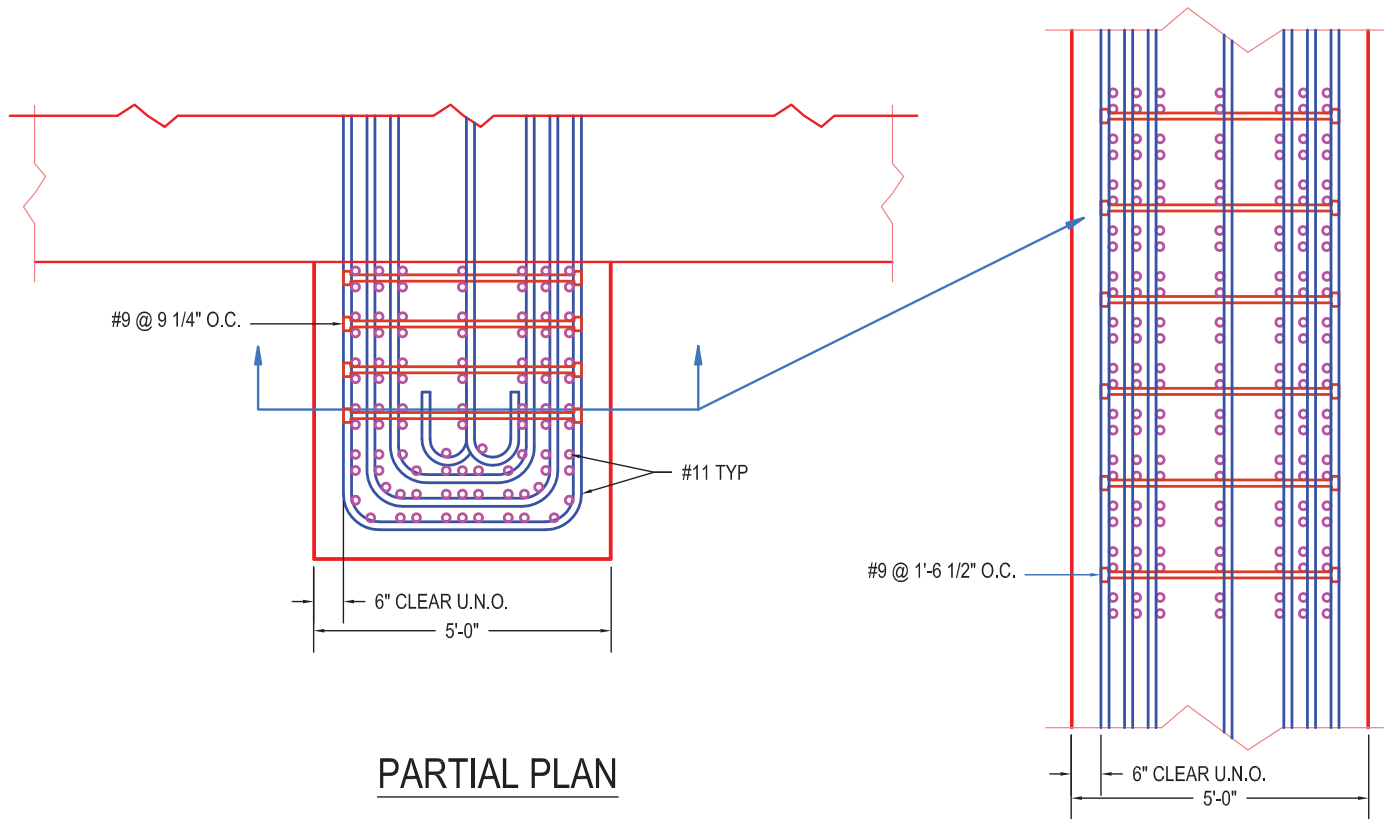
B-11: RXB Reinforcement Elevation at Grid Line 3 Wall
